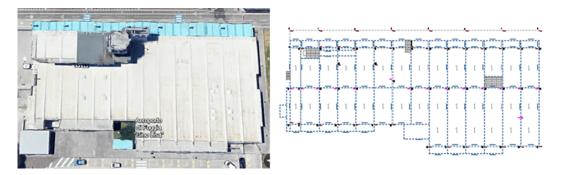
Current arrangement (left) and top view of the raised floor (right). Left picture taken from google images
